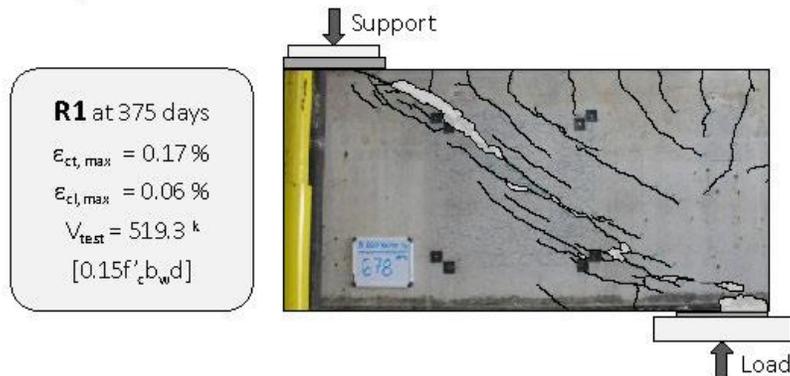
Example of shear crack picture reported by the FSEL Deschenes, D. J., Bayrak, O., & Folliard, K. J. (2009).
